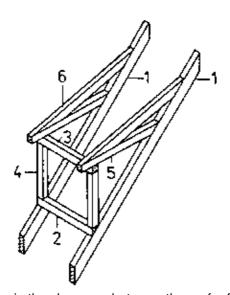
Roof window in the clearance between the roof rafters (rafter distance)
